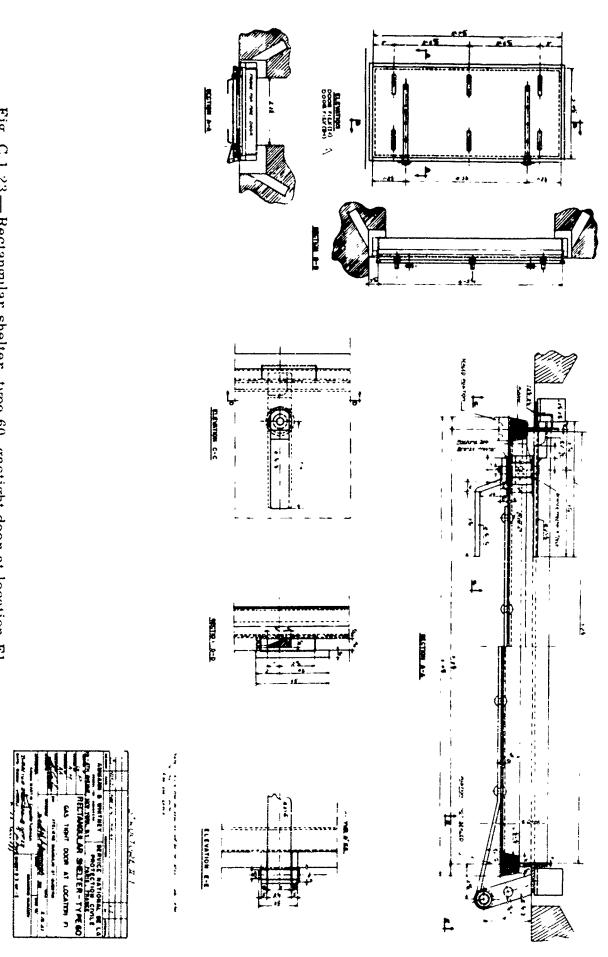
Rectangular shelter, type 60, gastight door at location F1.
